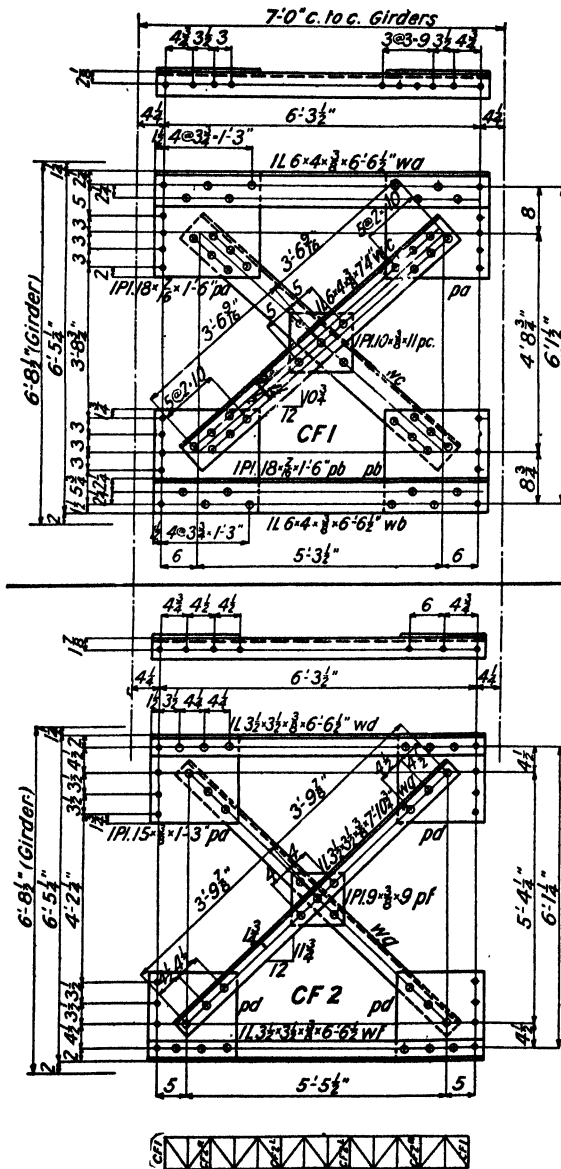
Cross Frames for Deck Girder Railroad Bridge.
